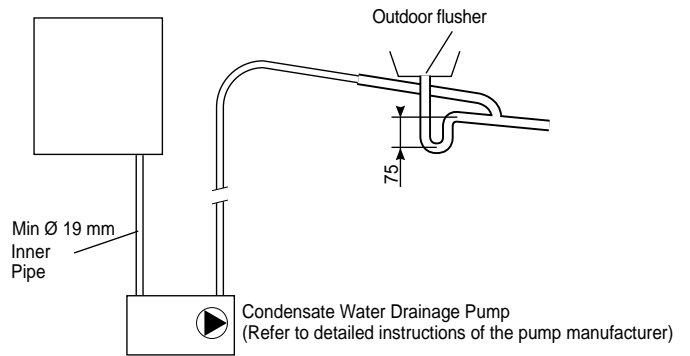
Typical Connection Method of a Condensate Water Drainage Pipe (refer to detailed instructions of the pump manufacturer)
